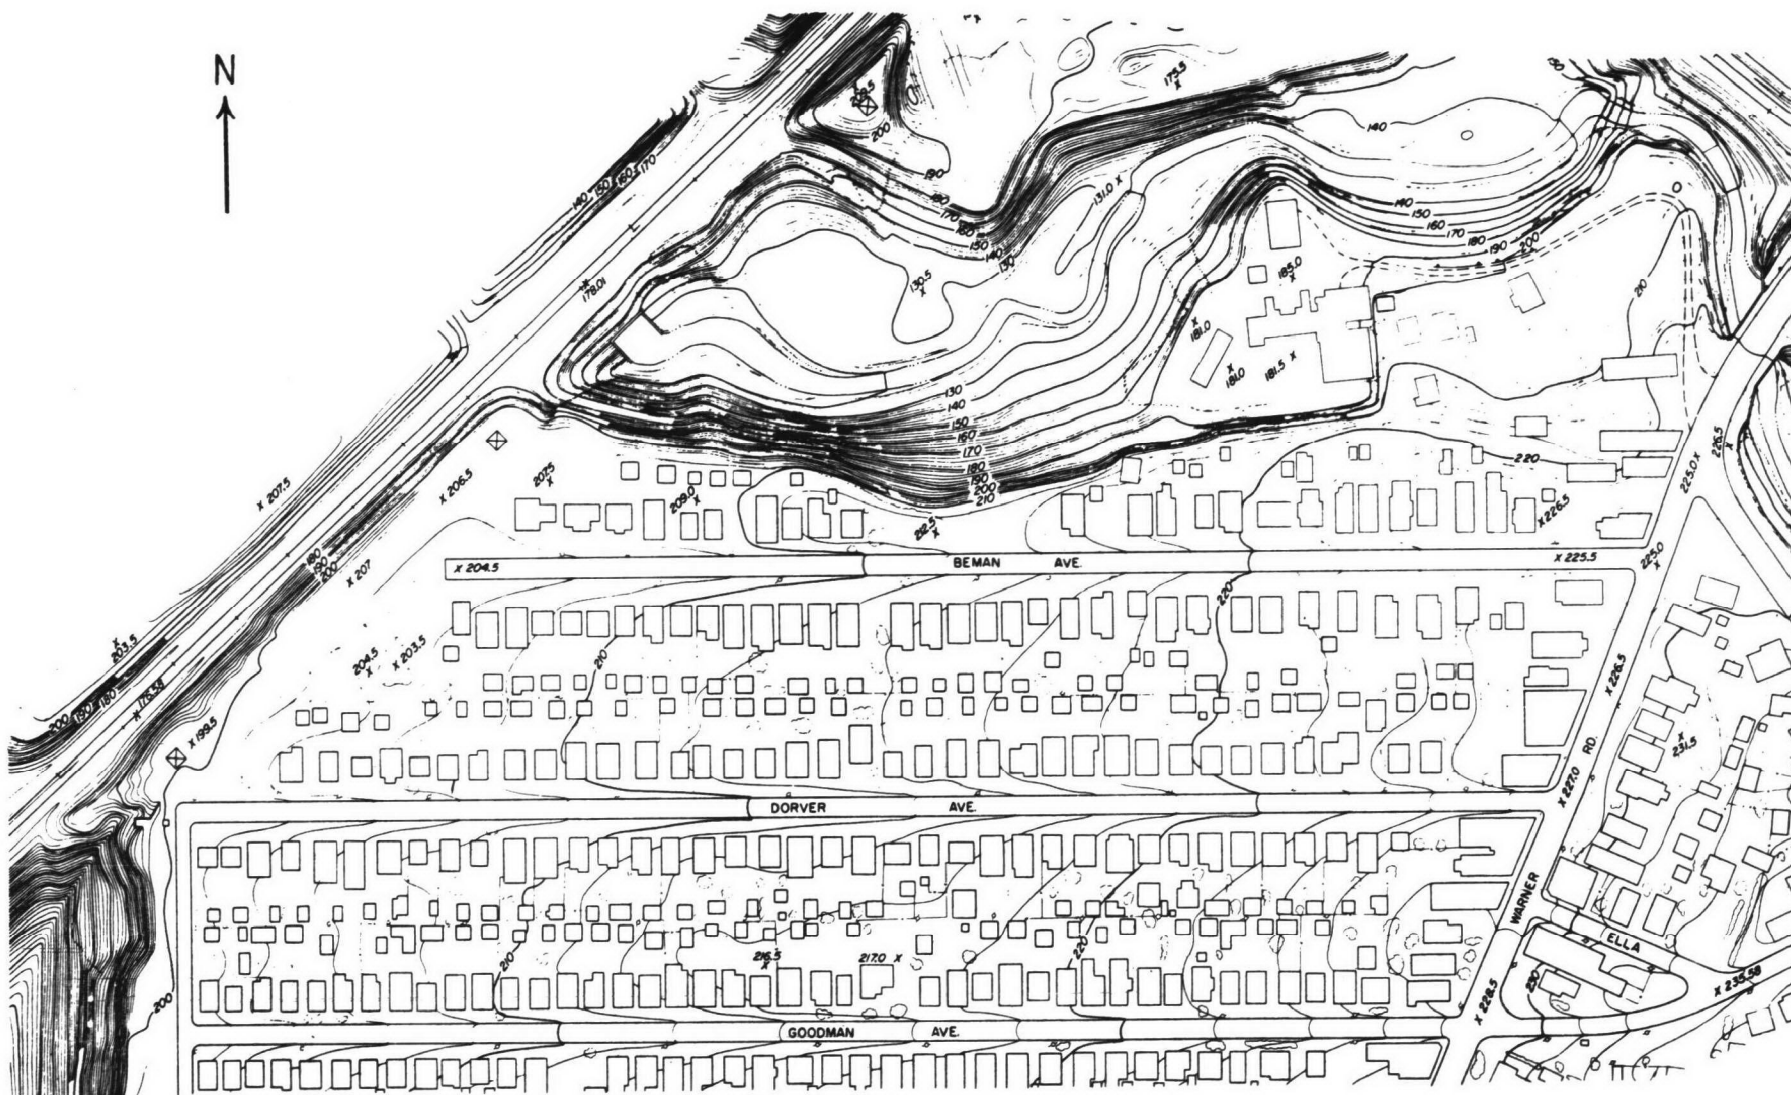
Figure IV. Topographical representation of Beman Avenue drainage area. Pilot filter site is 30 feet from west end of Dorver Avenue, 1"=170'
